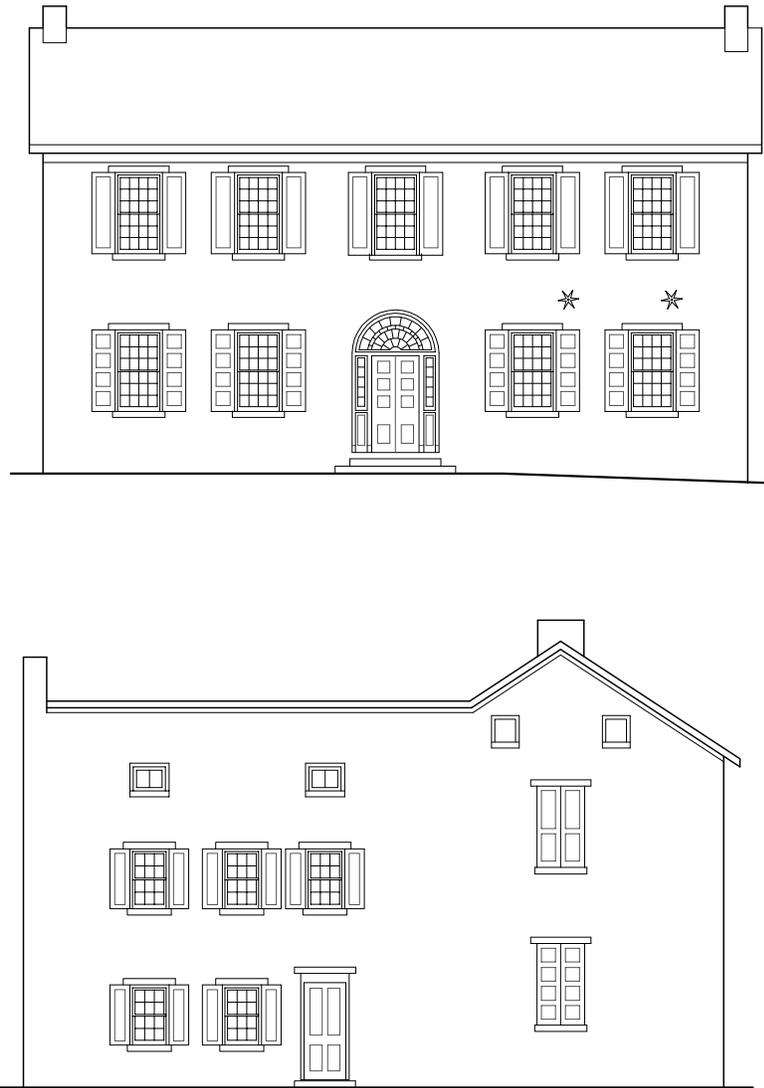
Thomas^{IV} Barber house, drawing of the south facing front and west gable elevations.
